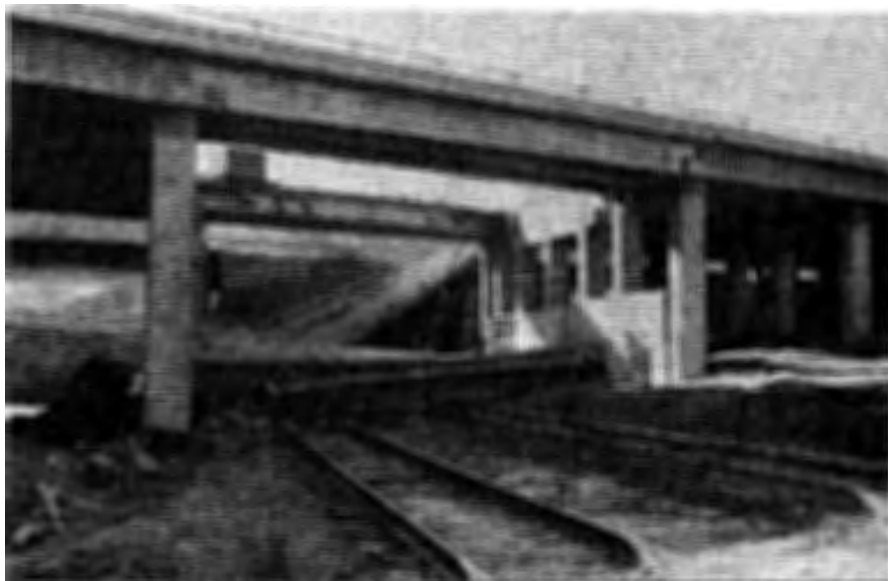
San Fernando Road Overhead (Widen). Collapsed steel girder span between widening sections of precast prestressed girders.
